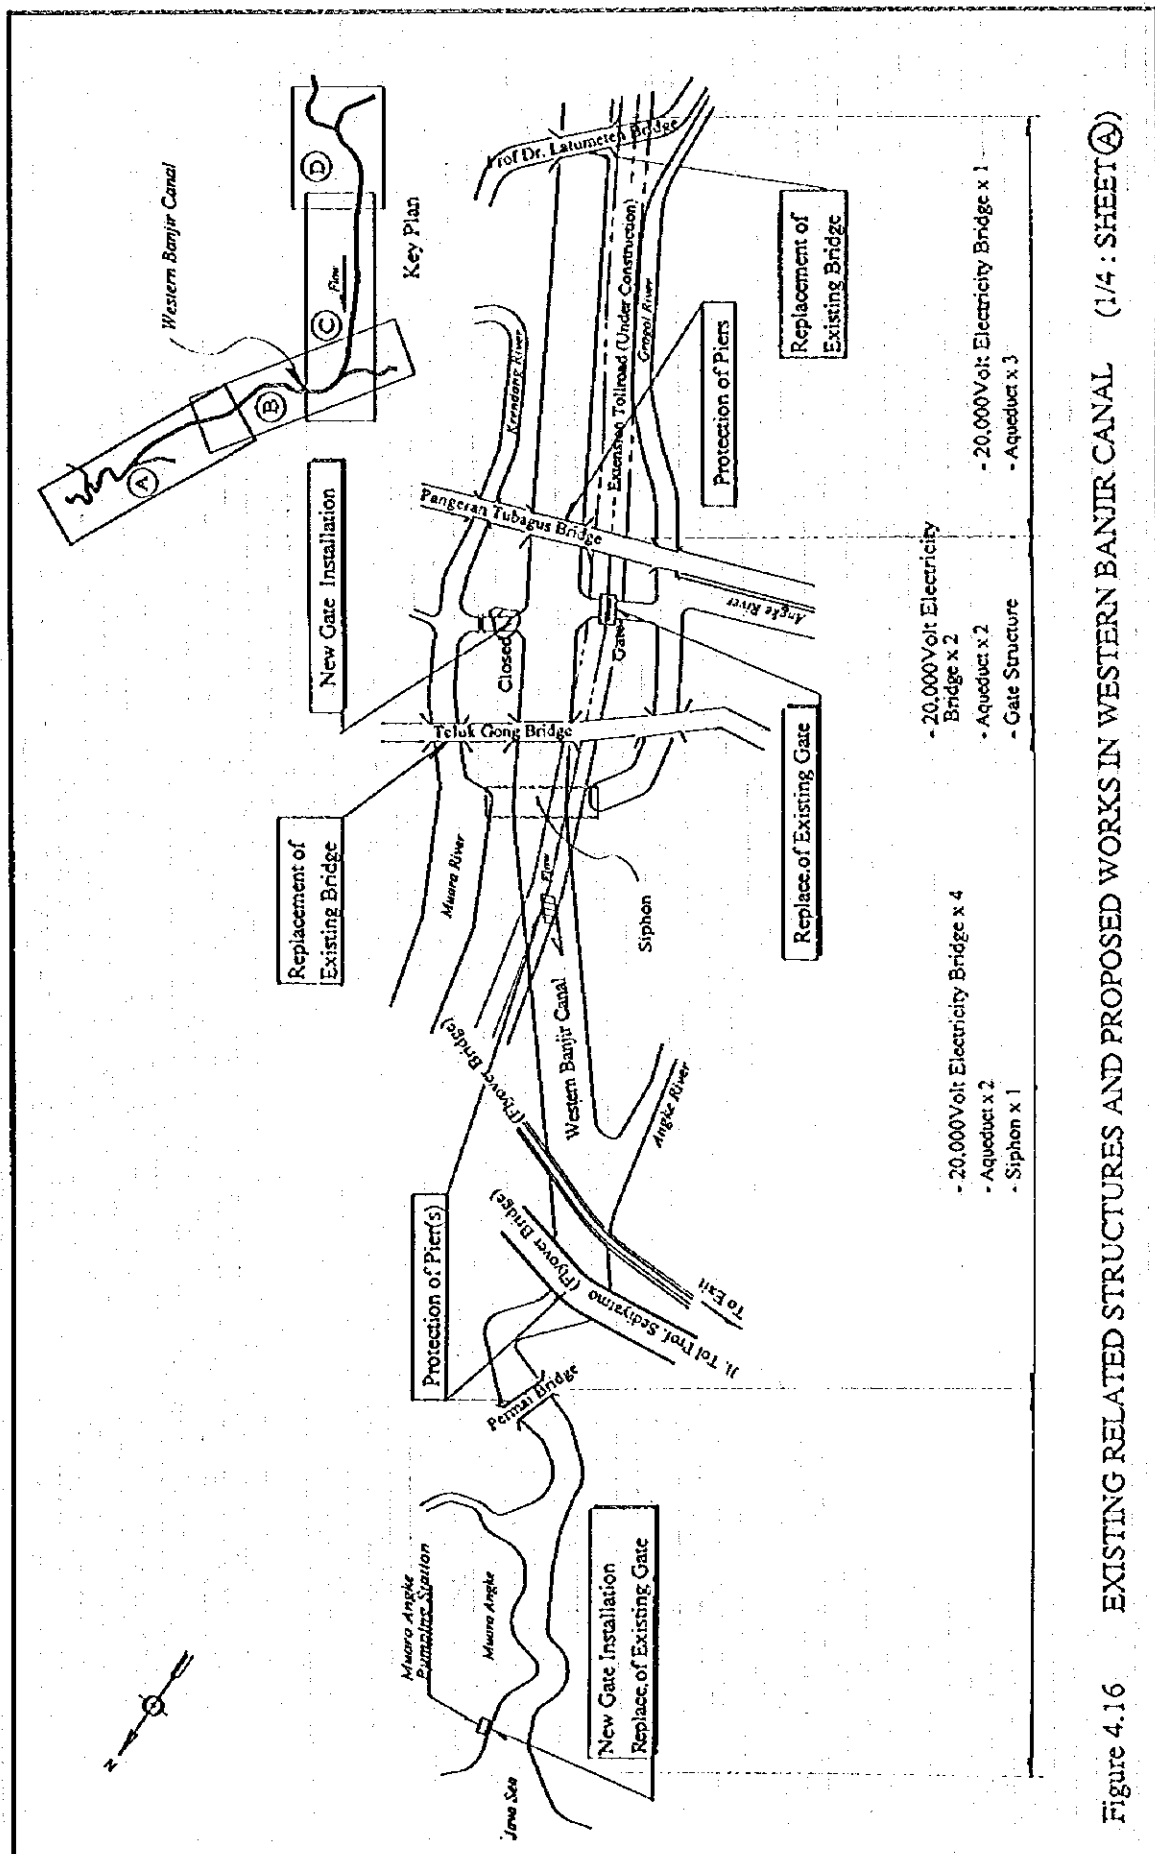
EXISTING RELATED STRUCTURES AND PROPOSED WORKS IN WESTERN BANJIR CANAL (1/4 : SHEET A)
